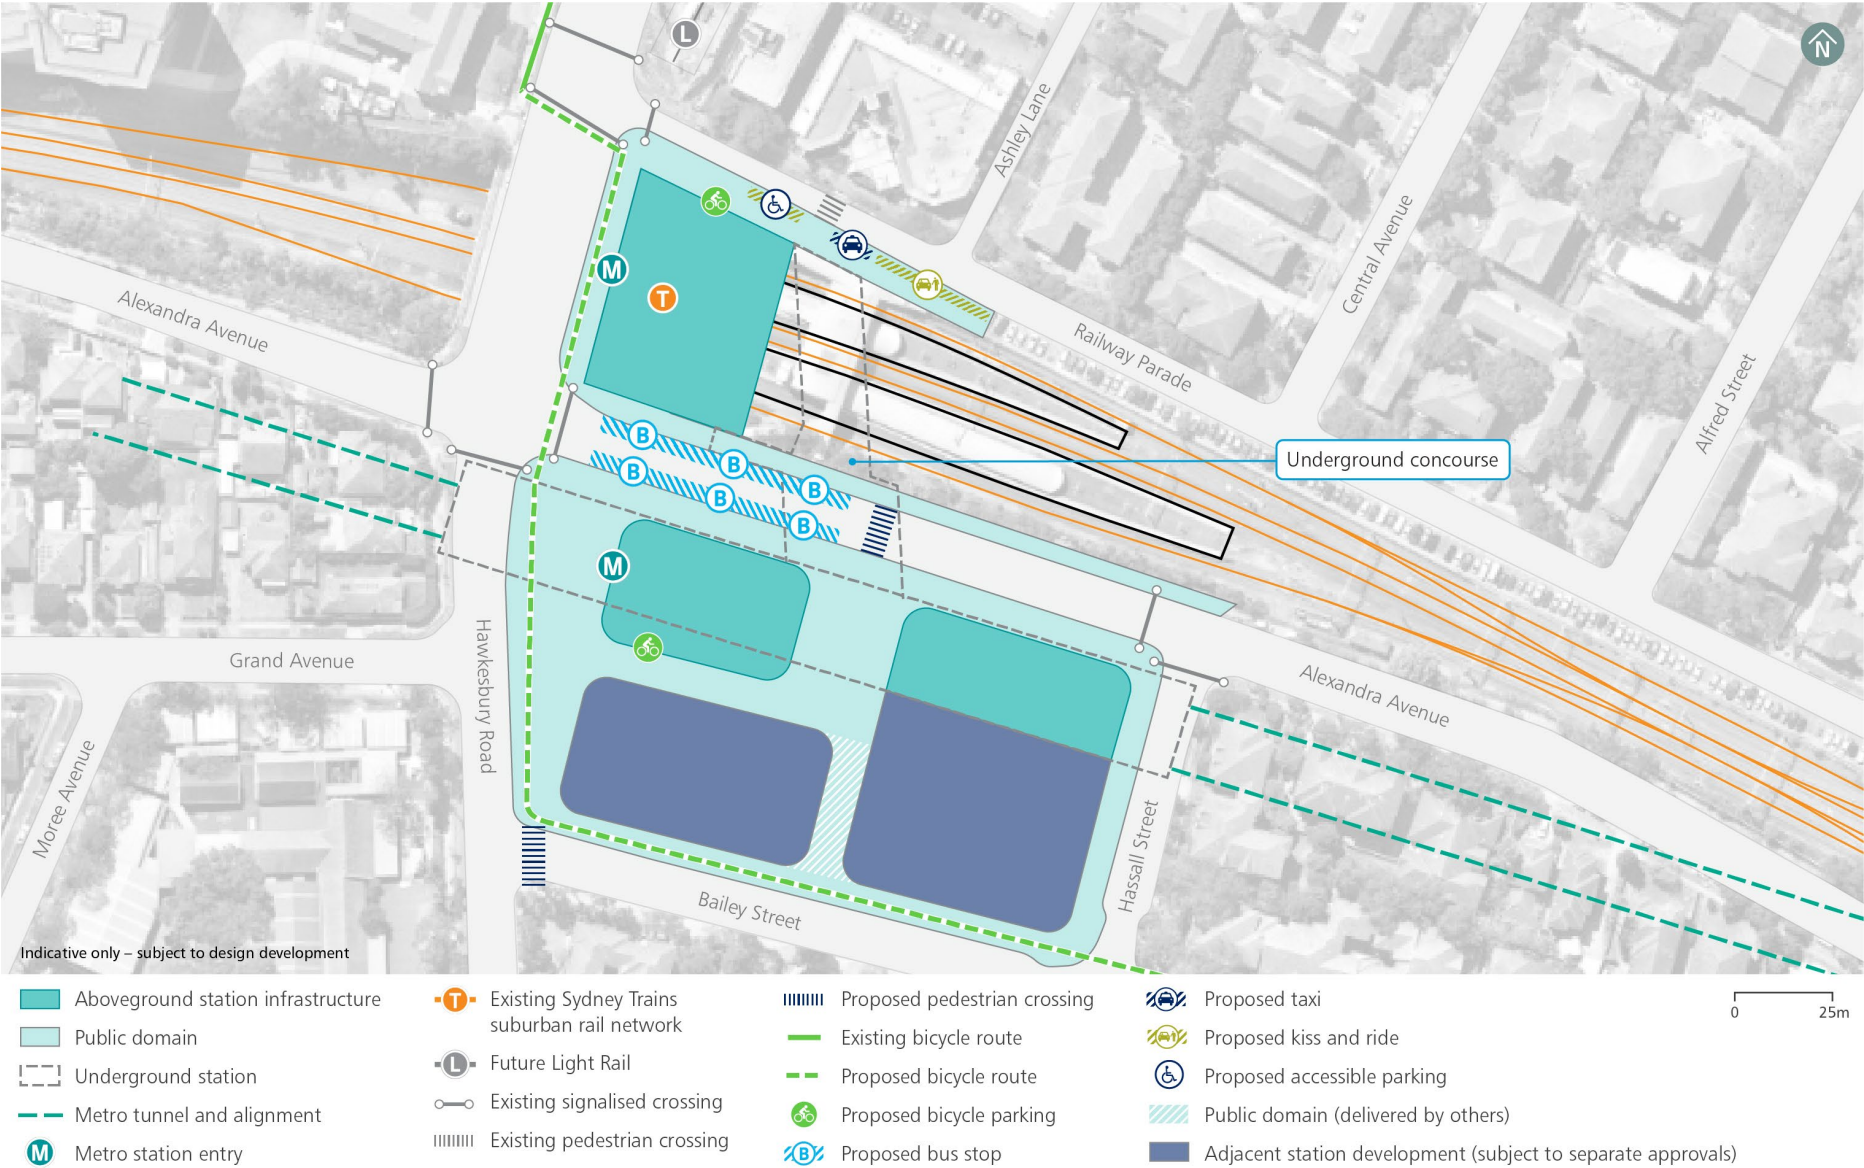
Indicative layout and key design elements – Westmead metro station
